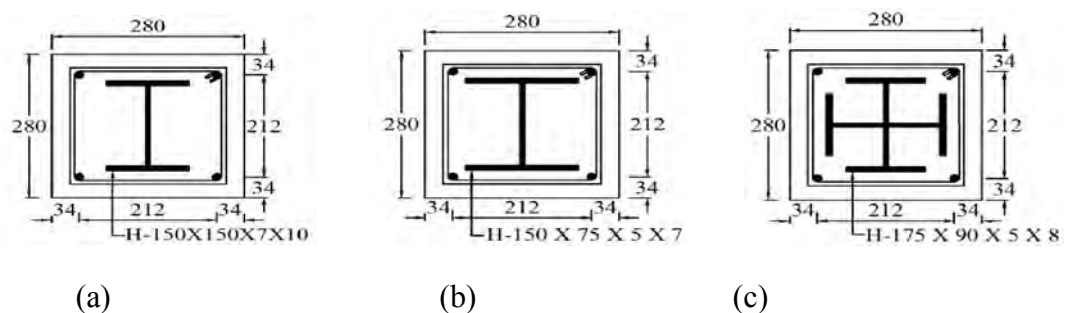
Typical cross sections of FEC columns (Chen and Yeh 1996)
